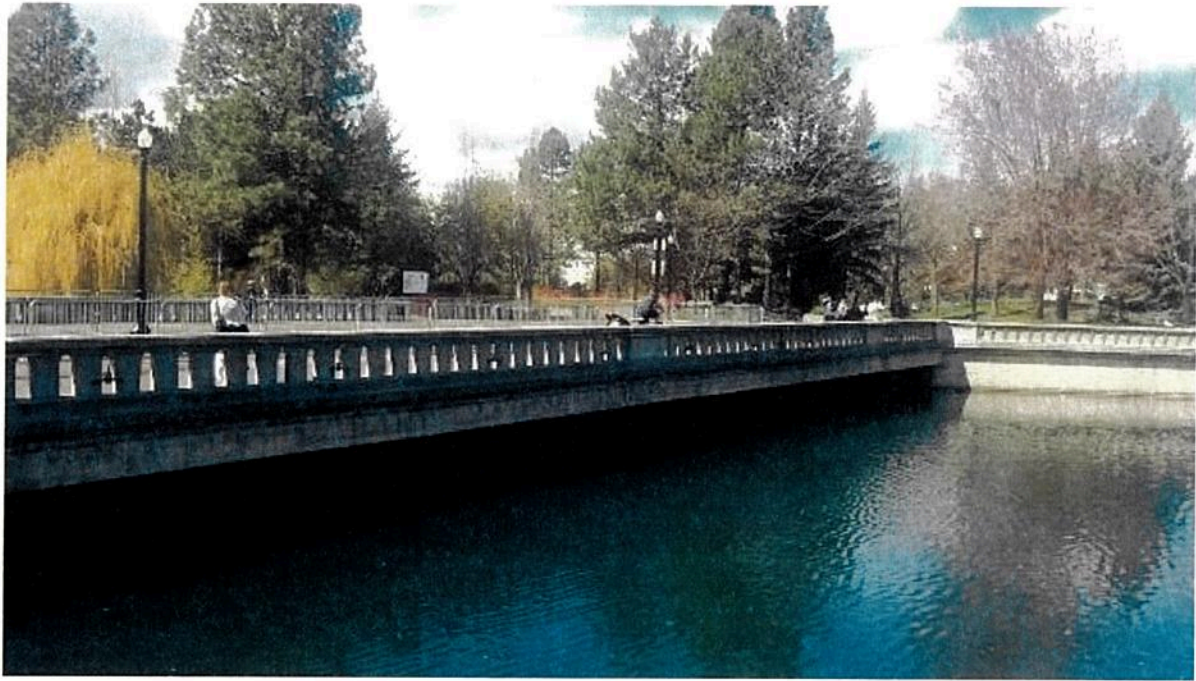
On south river bank looking at northeast corner of the Howard Street South Channel Bridge and the wing wall that connects the bridge to concrete walls that makeup Avista's power facility's forebay.
